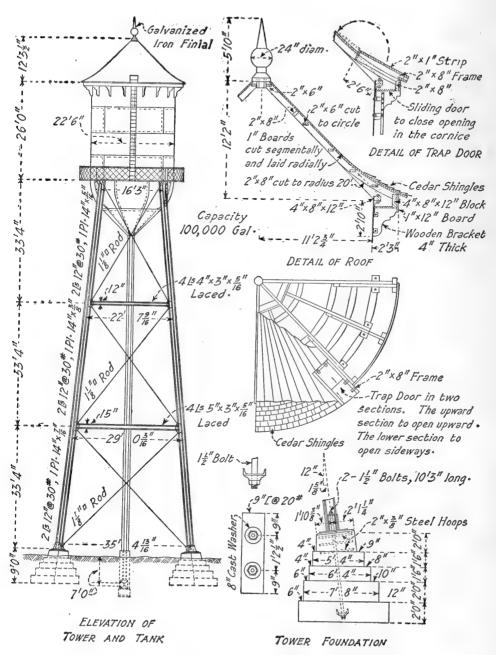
Elevated Tank and Tower, Jackson, Minn.
